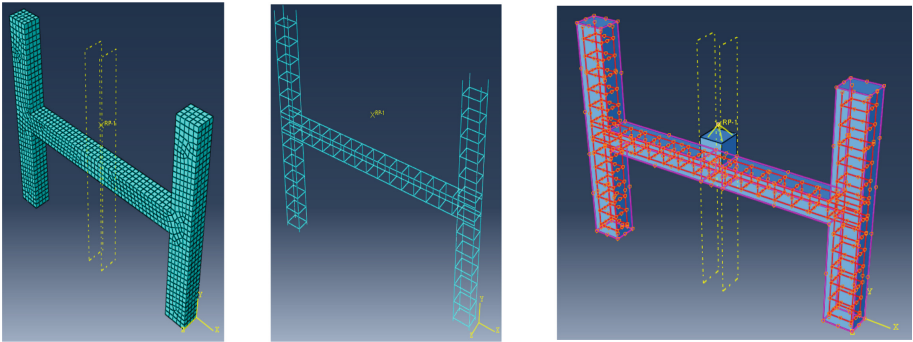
Concrete, reinforcement steel rods and the entire RC frame structure modelled in Abaqus.
